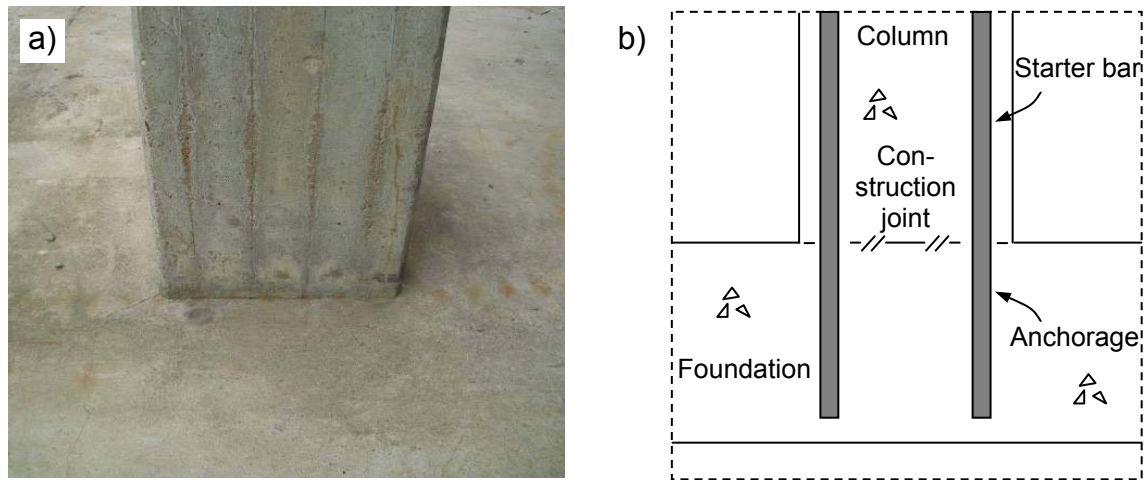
Column-to-foundation connection as an example for structural connections: a) Photo; b) Schematic
